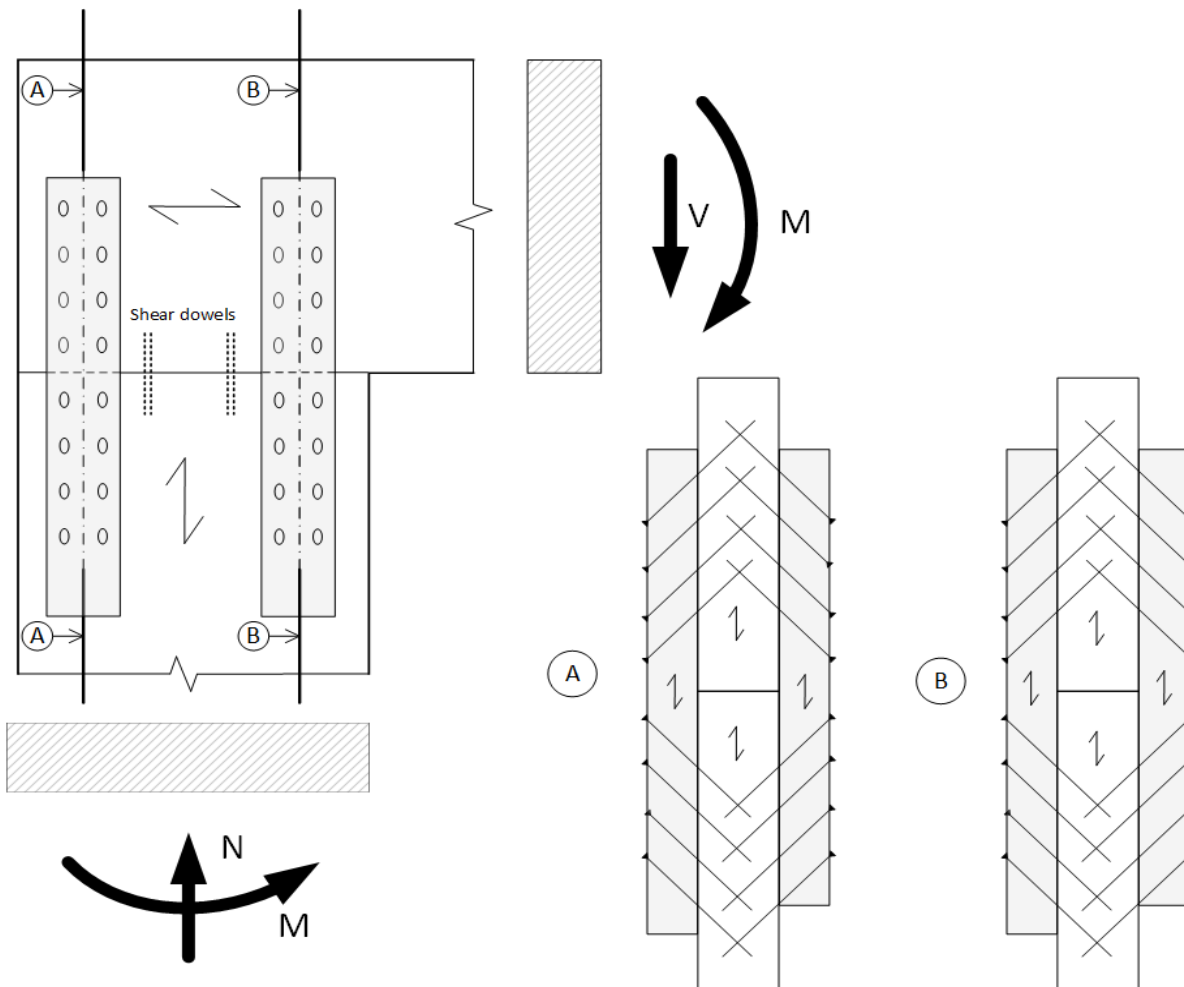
Proposed beam-column joint utilising inclined screws.
